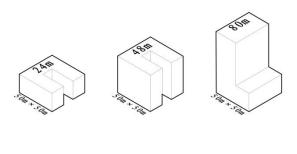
Plan – Units of Qixian Source: Made by Prof. LI Zhenyu Studio, Tongji Architectural Design (Group) Co., Ltd.
